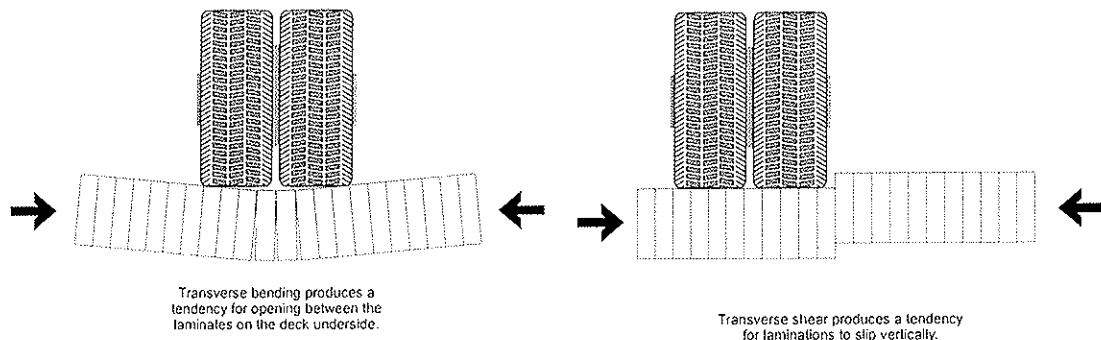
Structural Actions of a Stress Laminated Timber Plate Bridge deck
